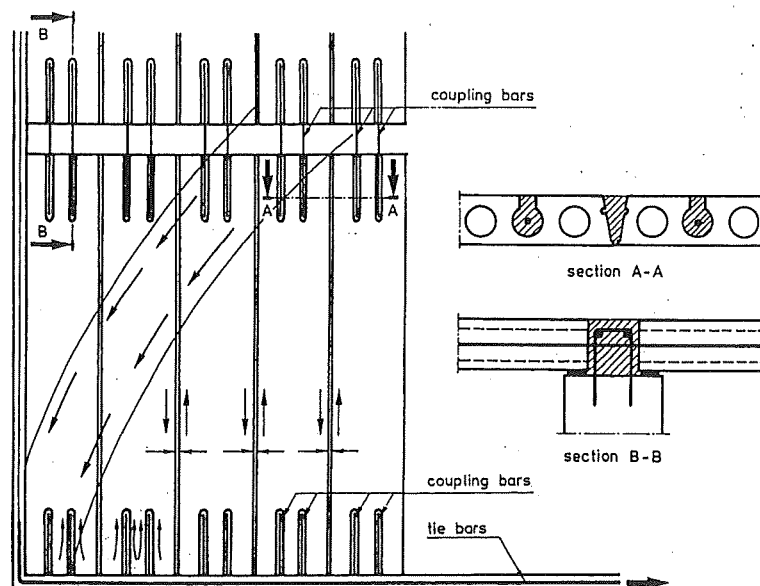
Tie-to-compression arch detail for an untopped hollow core floor slab involving grouted cores [Bruggeling and Huyghe, 1991]
